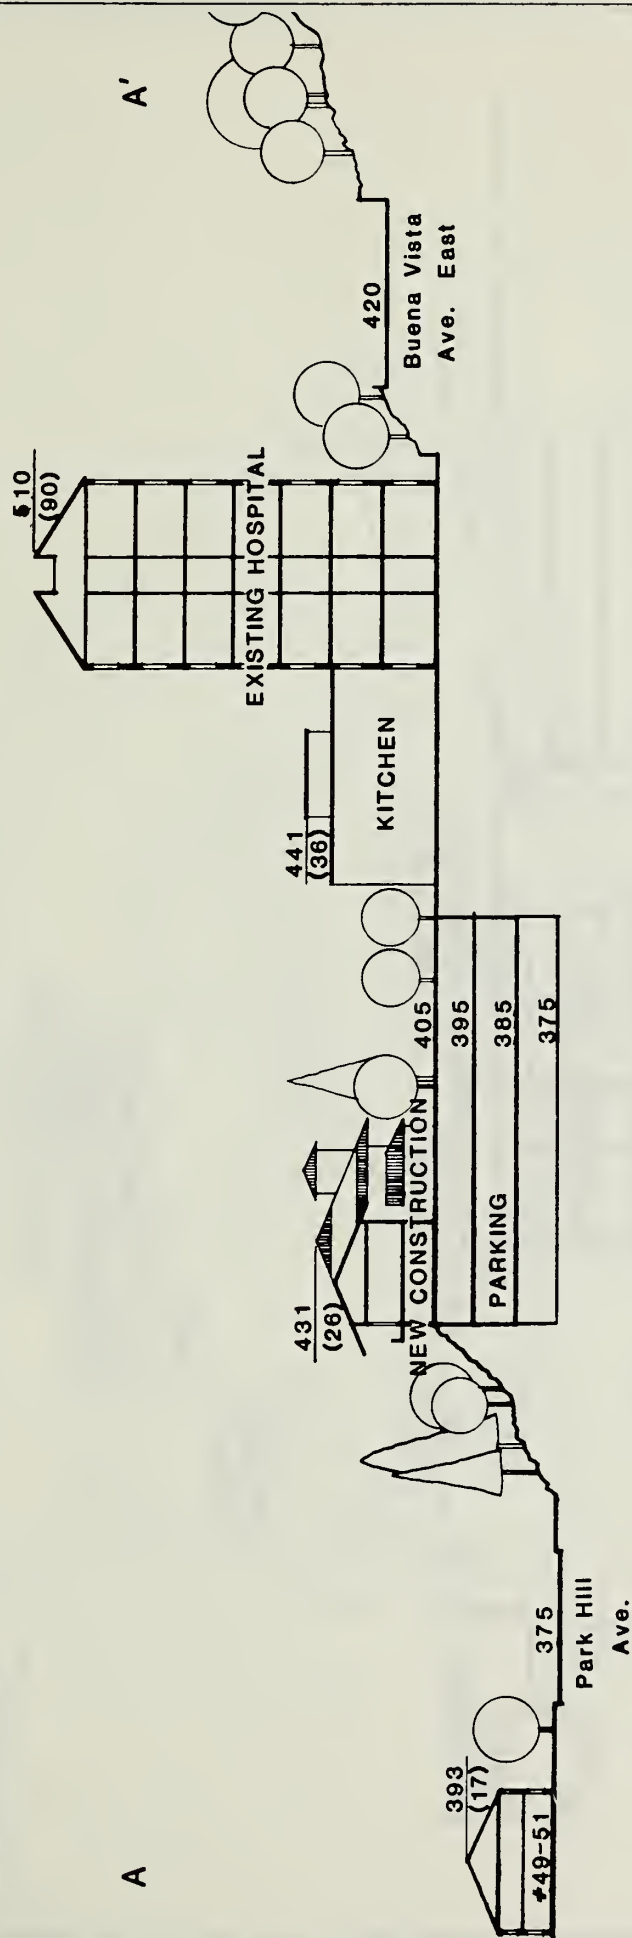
East Elevation (Facing Park Hill Ave.)
